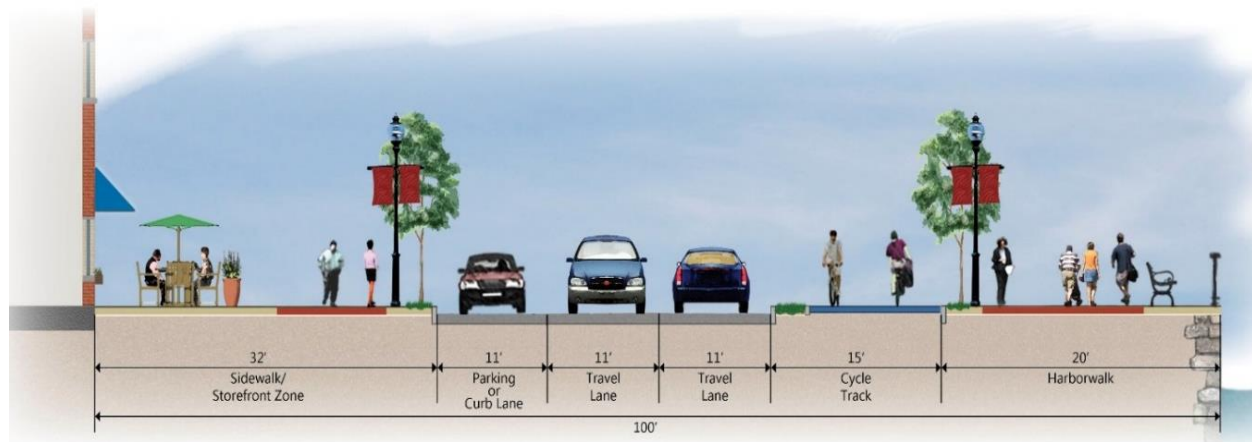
Dorchester Avenue – Typical Cross-Section (Proposed) Looking Northeast
